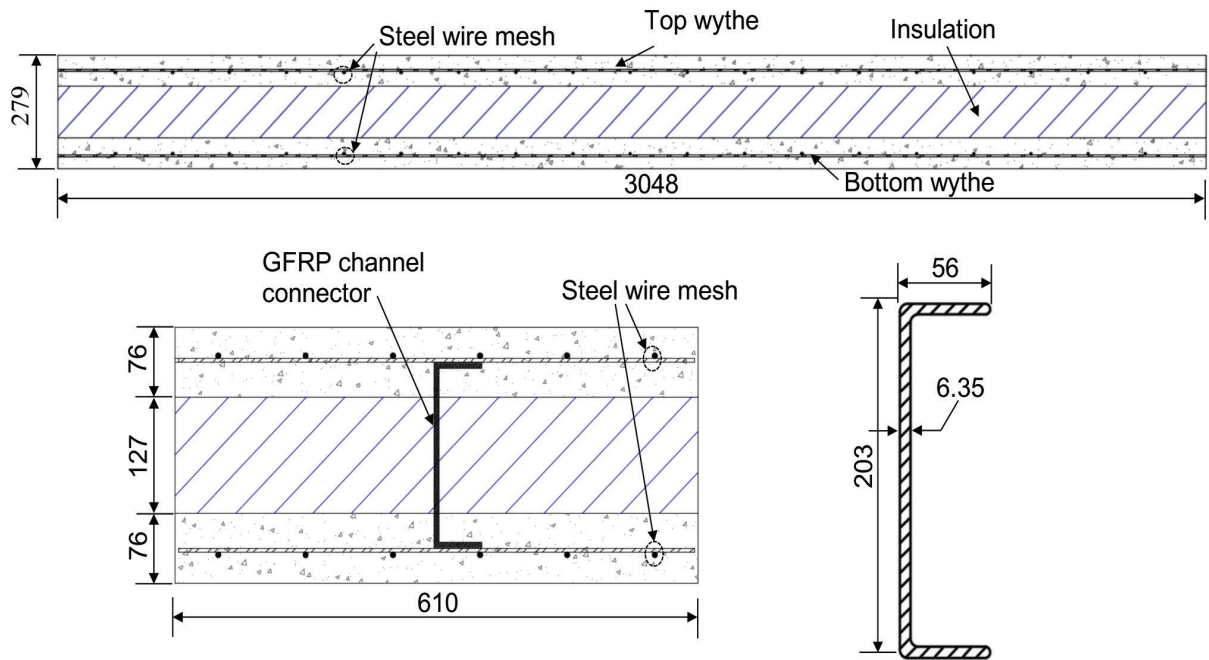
Geometry of test panels shown for elevation (top), panel cross section (bottom left), and glass-fiber-reinforced polymer (GFRP) channel cross section (bottom right). Note: All dimensions are in millimeters. 1 mm = 0.0394 in.
